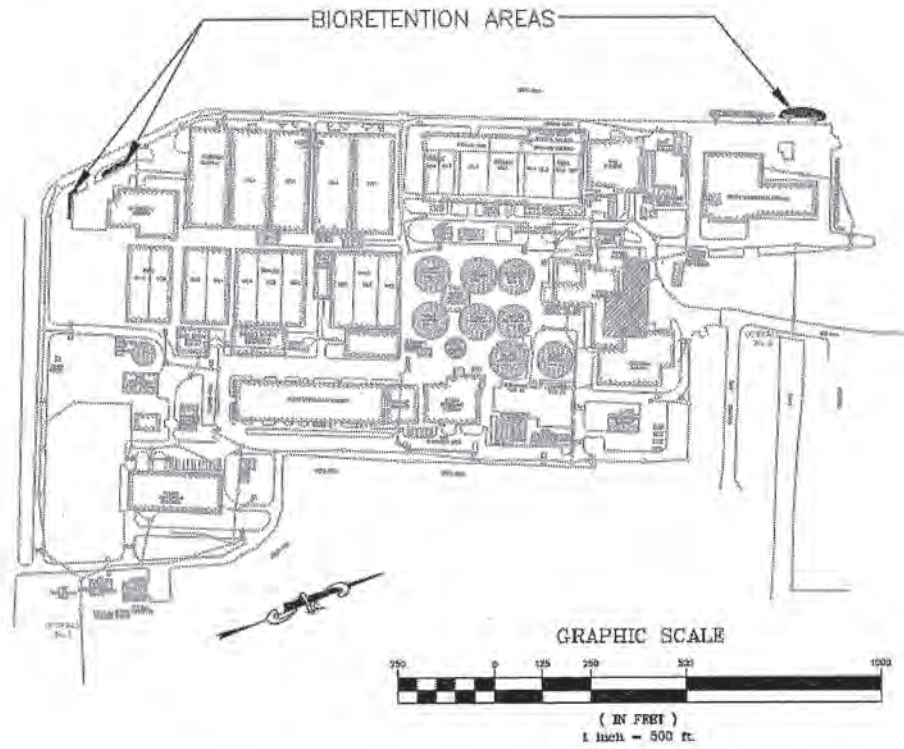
Bay Park WPCP Bioretention Area Site Plan
